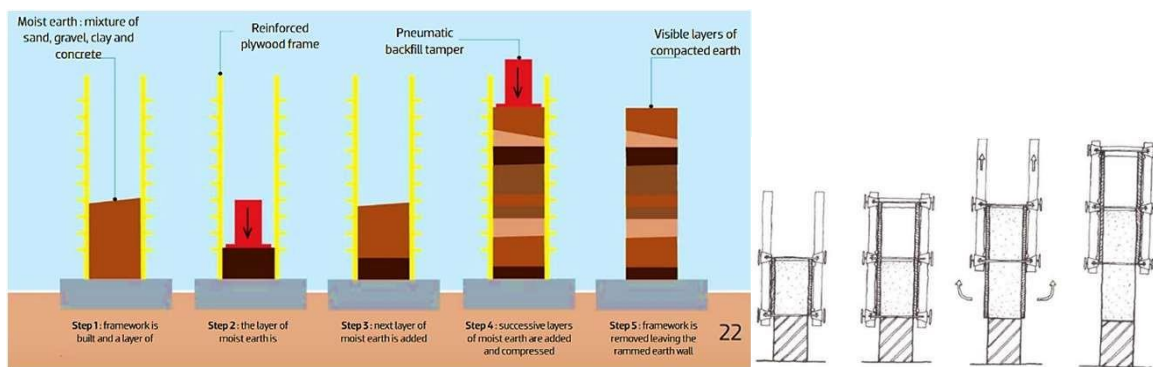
The vertical direction of Rammed Earth formwork & steps involved in ramming
